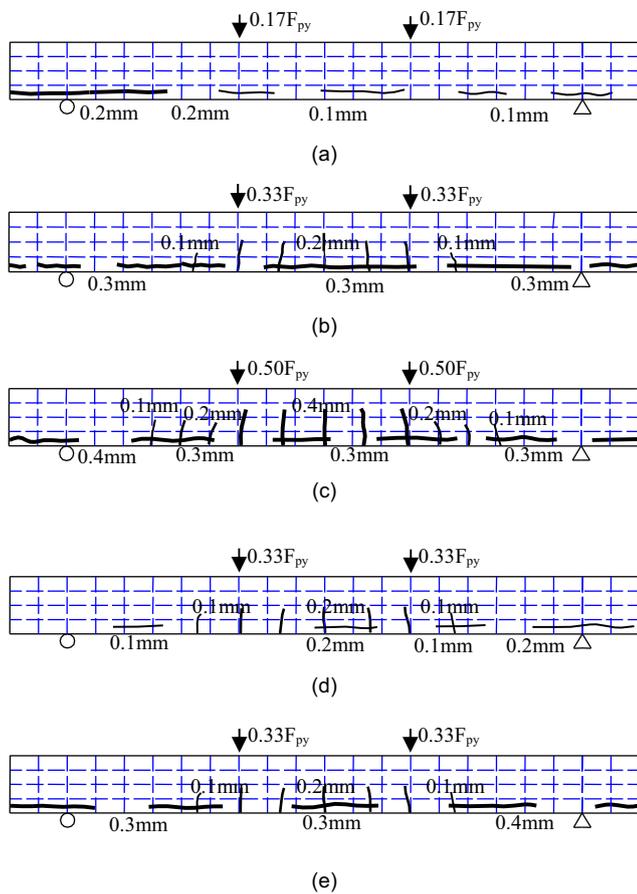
Crack patterns of specimens in Group B (180 days after corrosion) (a) Specimen B-17-50 (b) Specimen B-33-50 (c) Specimen B-50-50 (d) Specimen B-33-25 (e) Specimen B-33-100.
